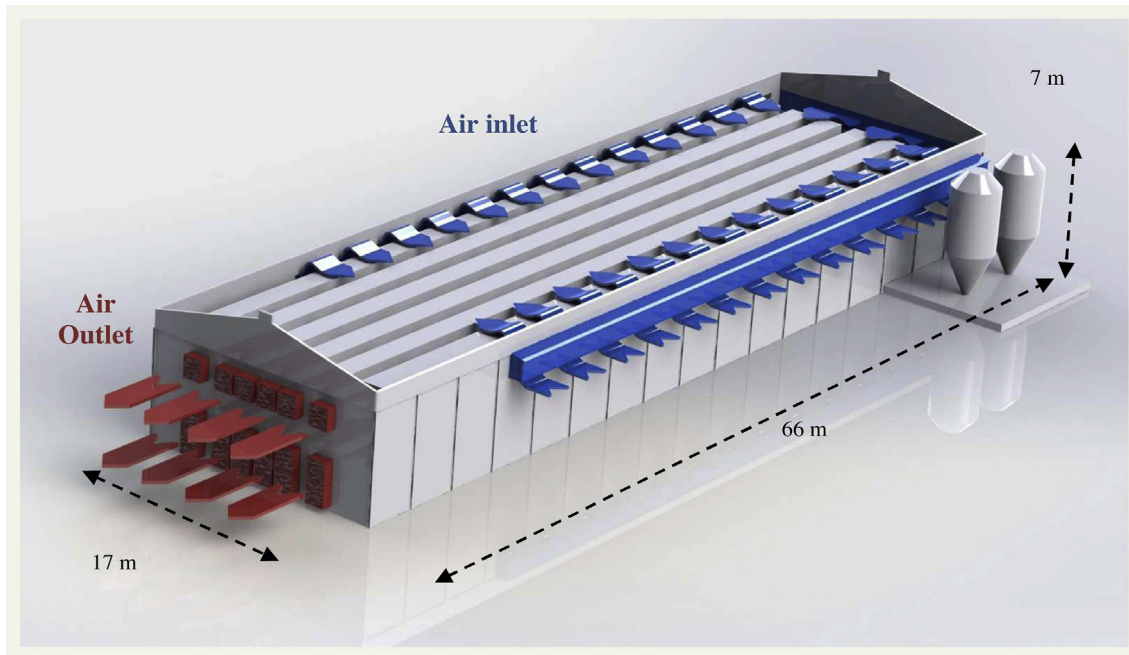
Layout of the house and scheme of the tunnel ventilation system.
